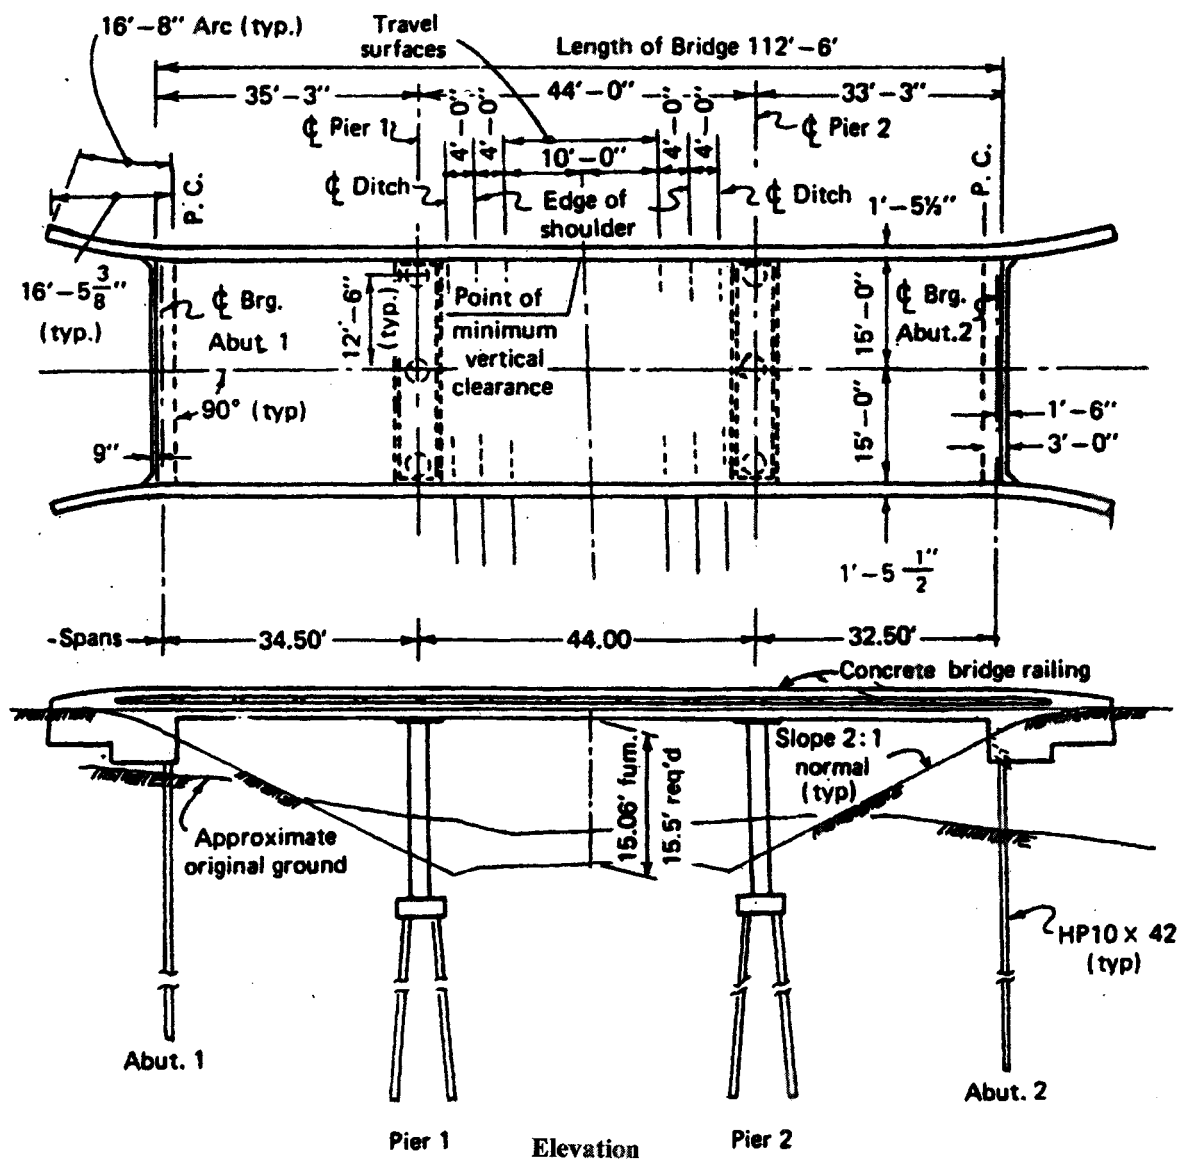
Plan and Elevation of Text Example Bridge (Heins and Lawrie (1984)).
